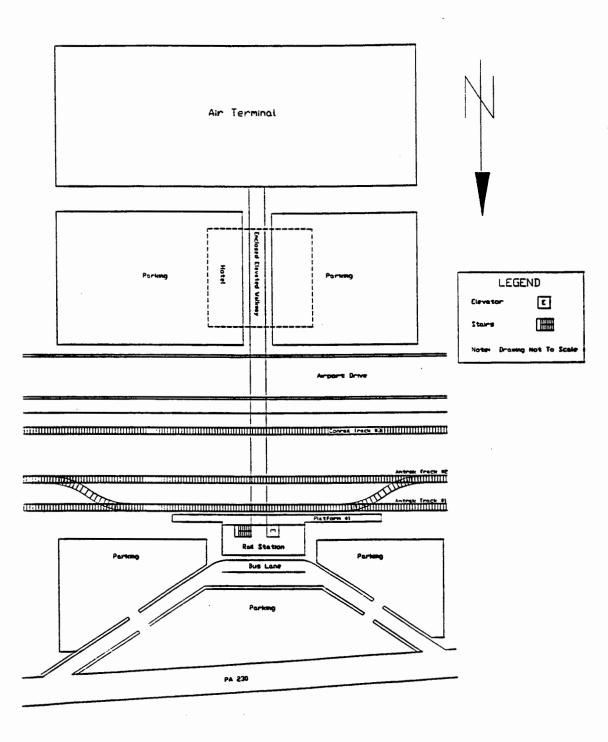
A: Station Side Platform with Overhead Walkway- Plan View
